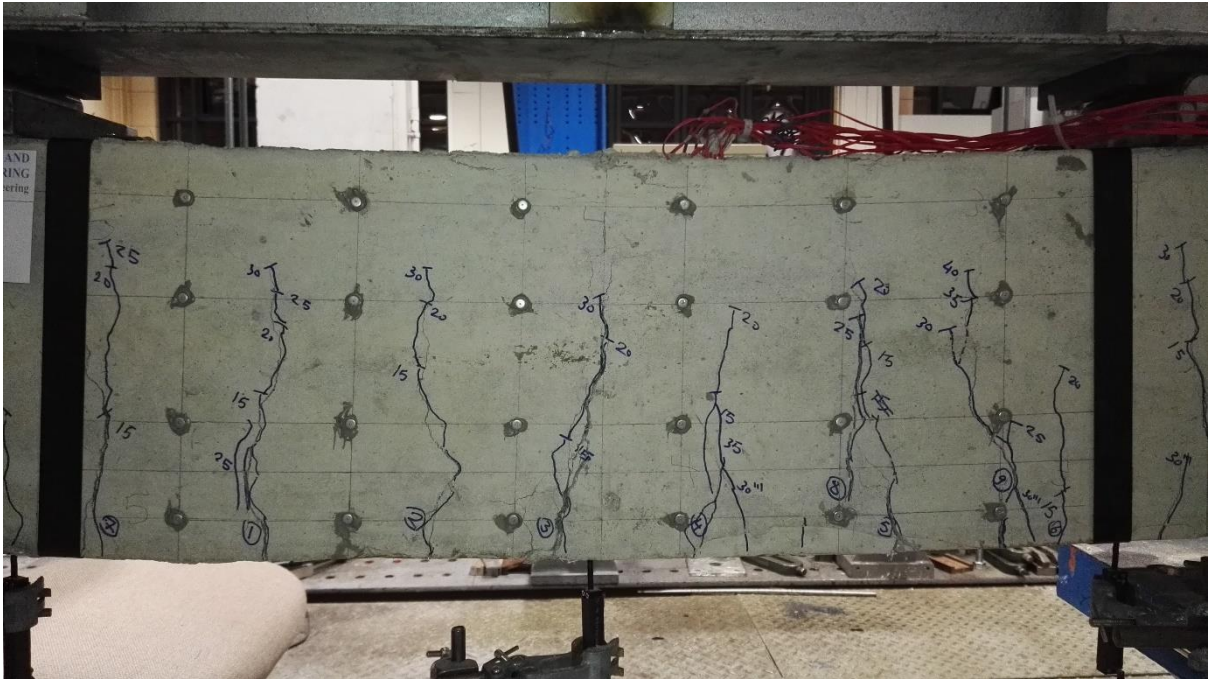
Final cracking pattern in constant moment zone in beam B2010.
